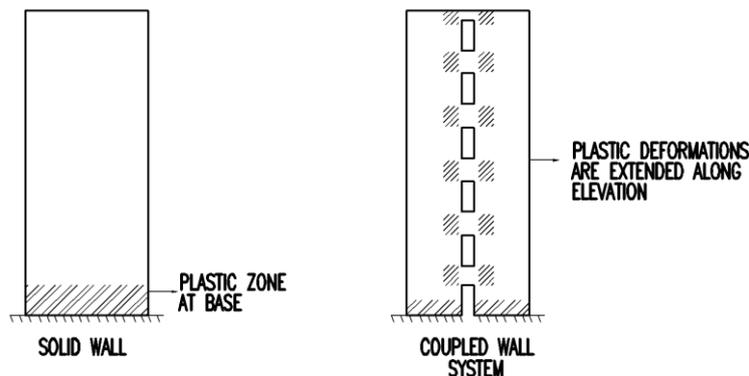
Plastic deformations on (a) solid wall and (b) coupled wall system
